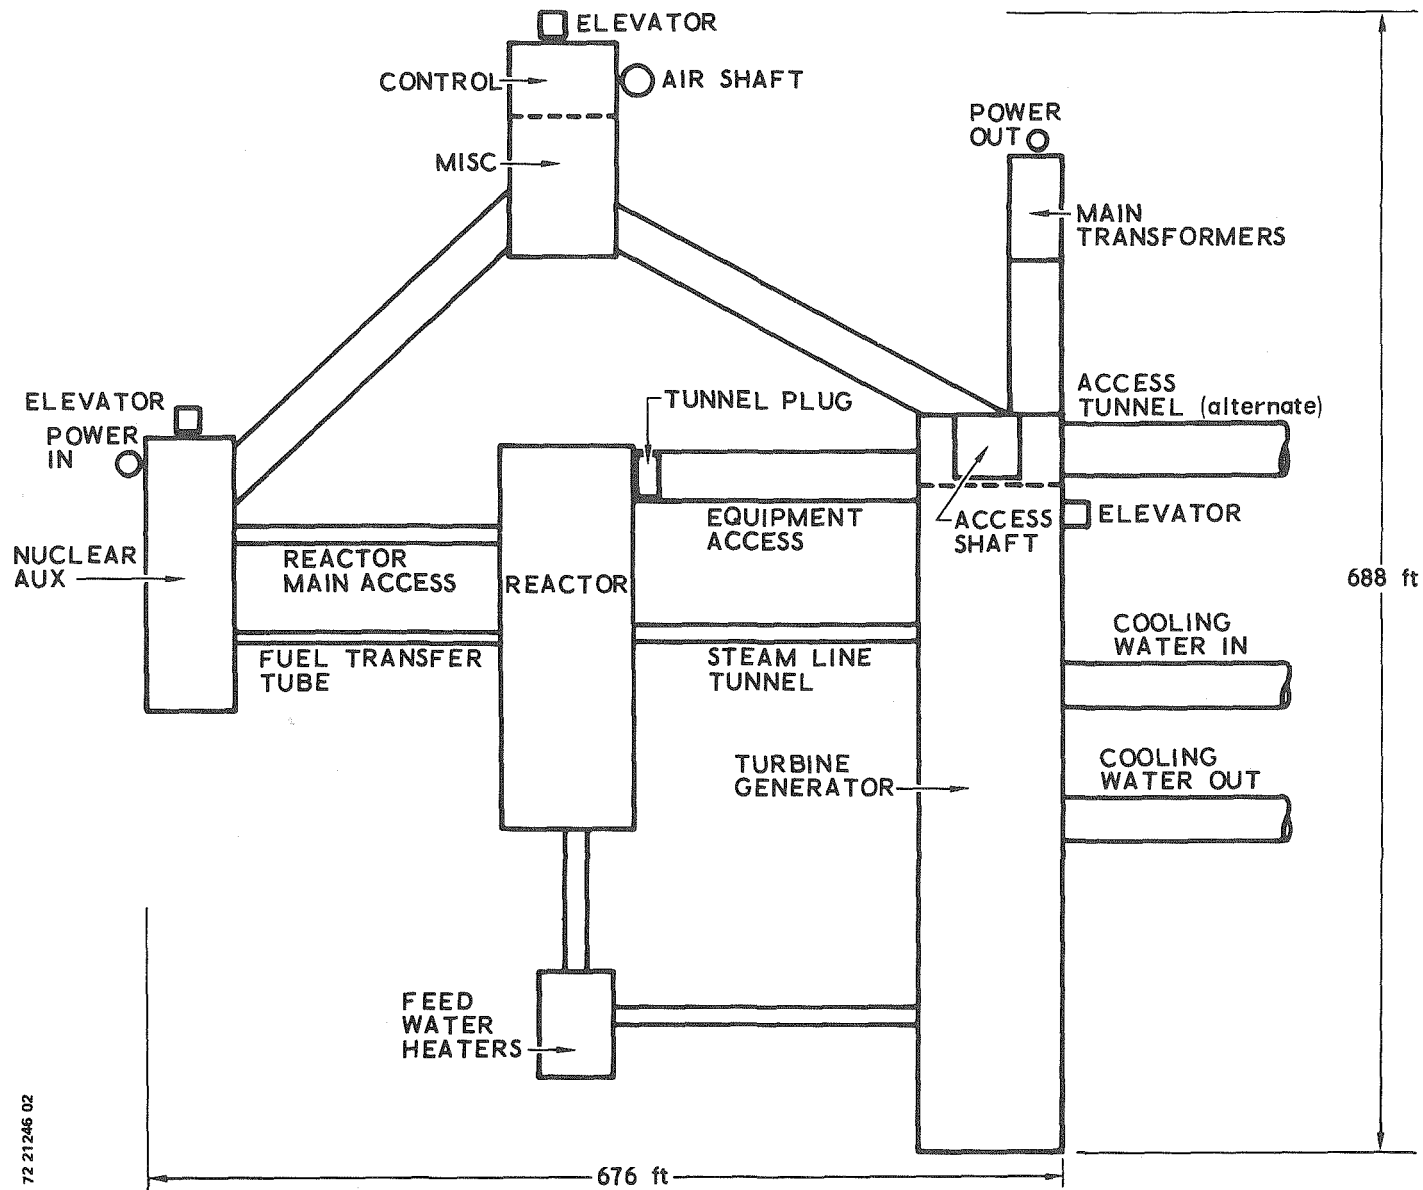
Sample Layout Underground PWR Nuclear Power Plant
